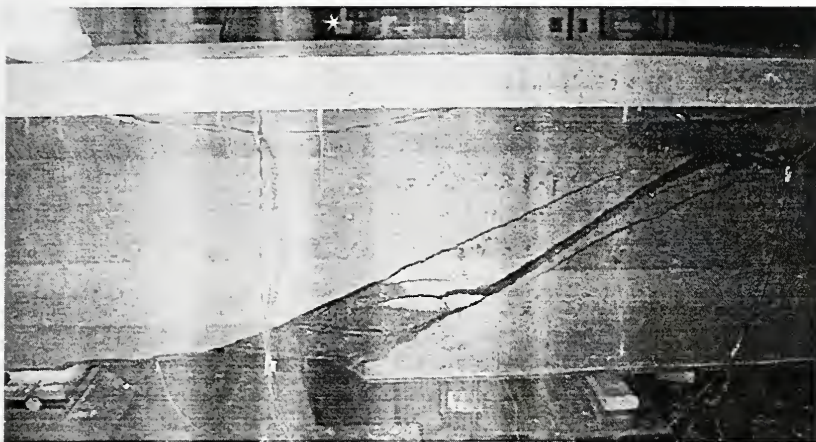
Web-Shear Crack in South Shear Span, Specimen PC10S, East Side
